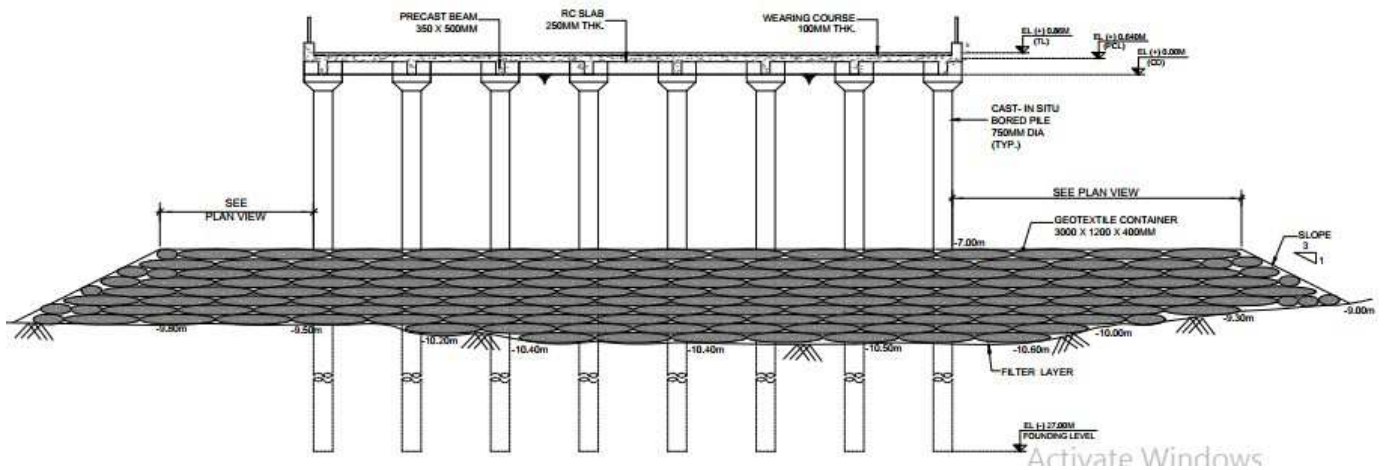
(b) Typical Longitudinal section of Geotextile Sand Containers Arrangements.
